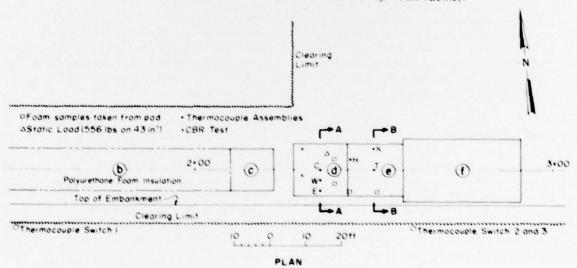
Site plan of sulfur foam sections and thermocouple assemblies.
